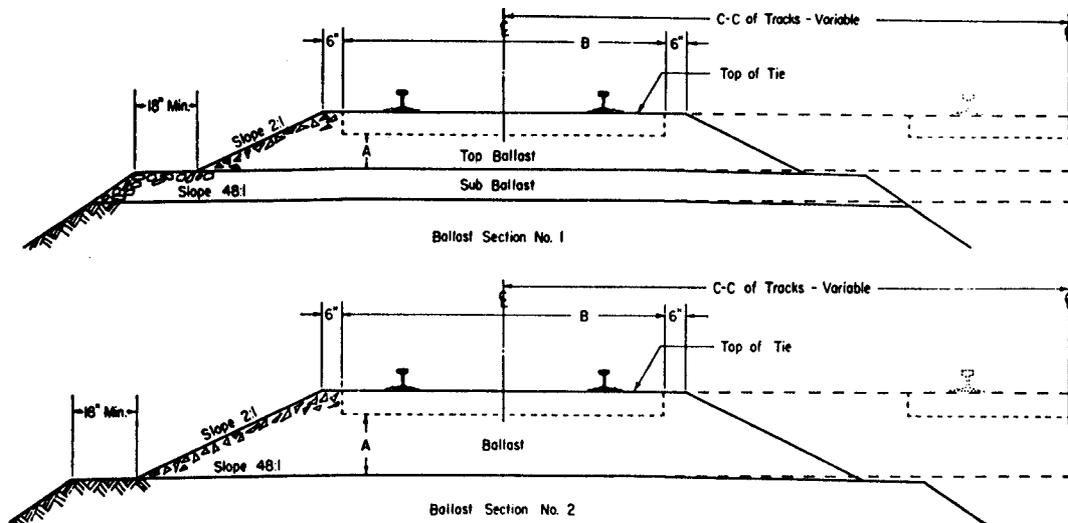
AREA ballast sections, single and multiple track, tangent.
